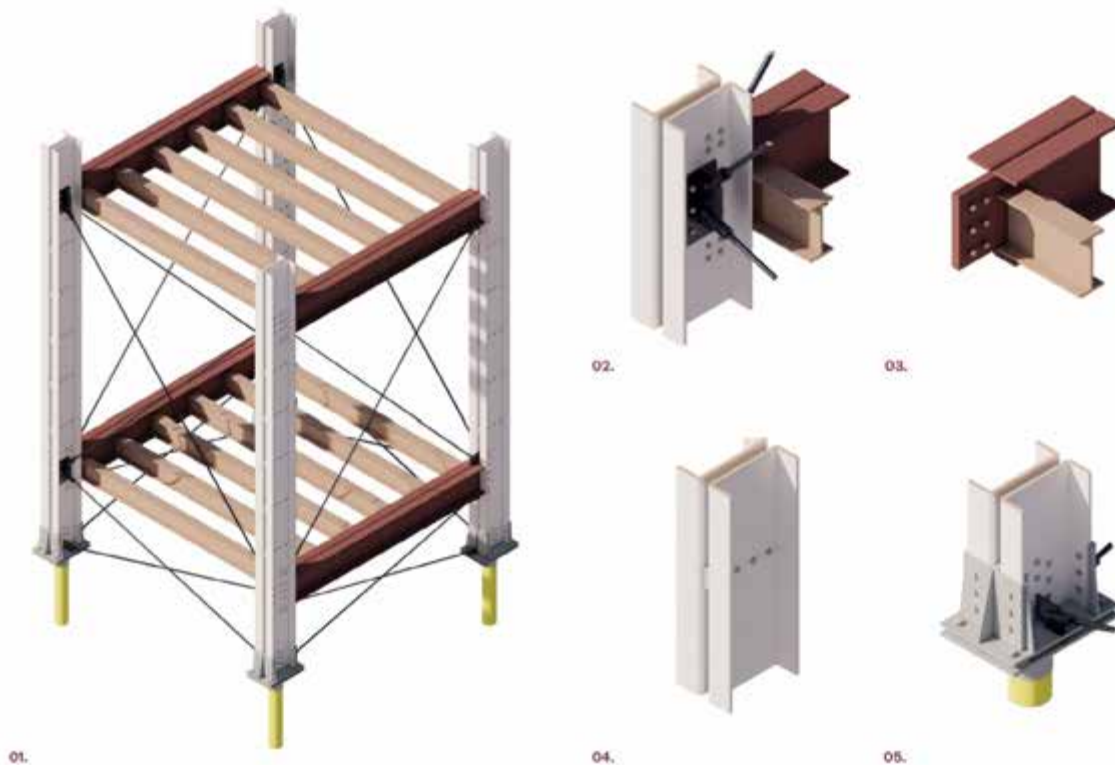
Transitional housing structure and details: 1) Pultruse Structure; 2) Main beam and column connection; 3) Secondary beam connection; 4) Spacer plate between columns profiles; 5) Column base plate;
